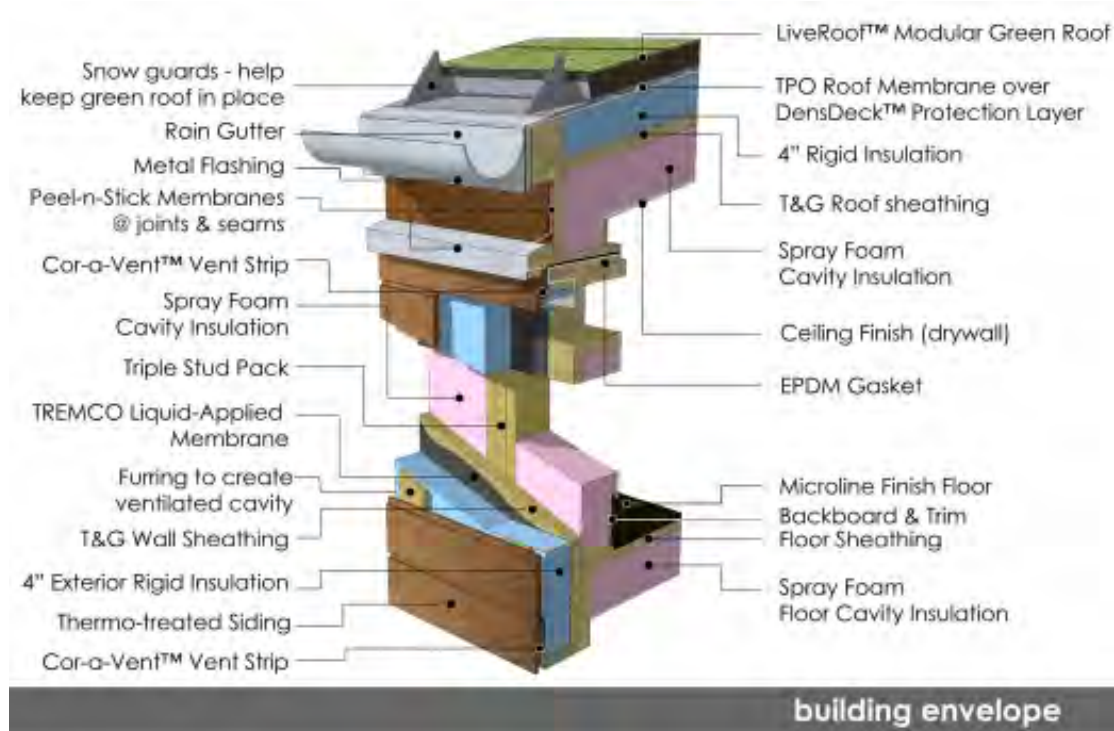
Building Envelope Diagram [Image by Mike Binder]
